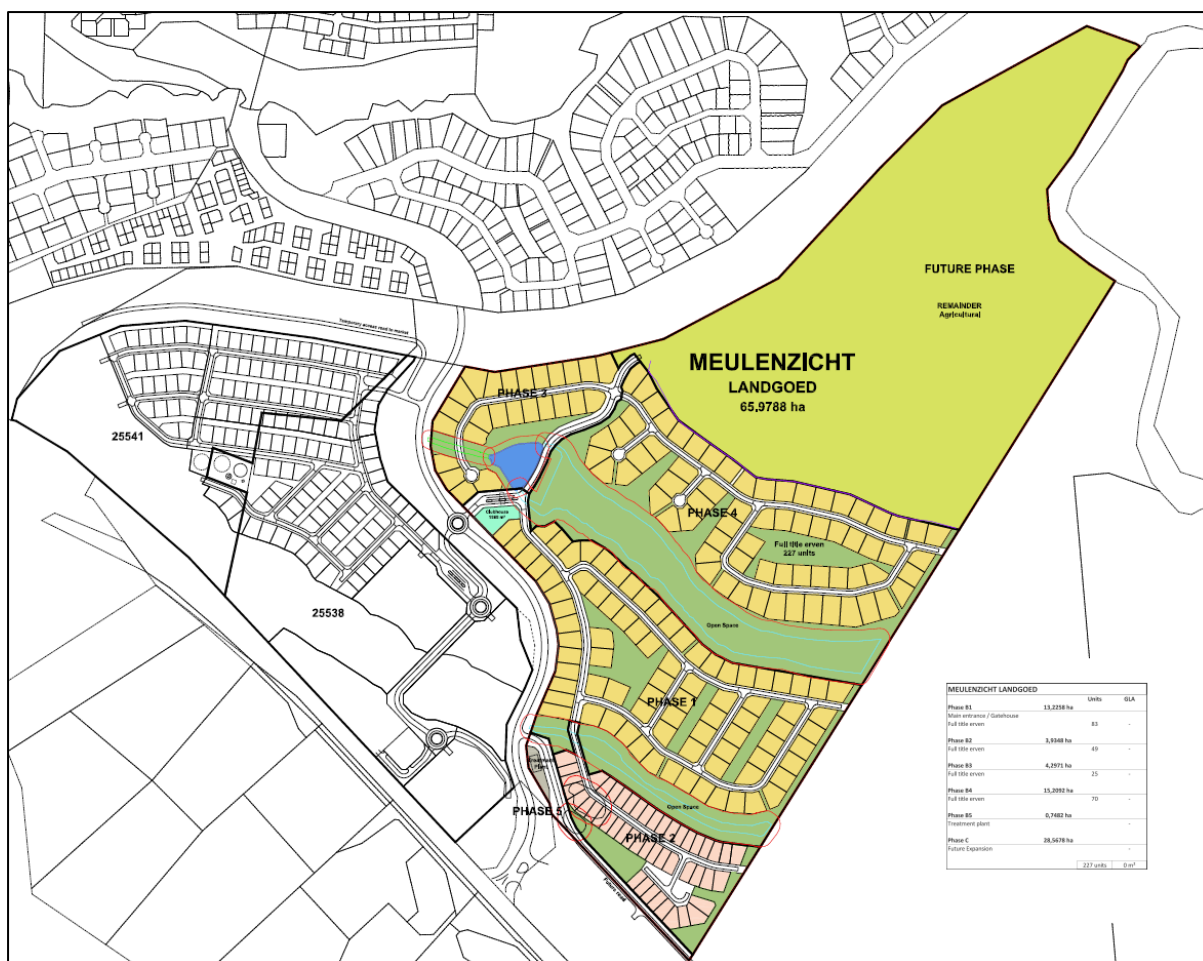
The latest site development plan (SDP) for Meulenzicht Landgoed.
